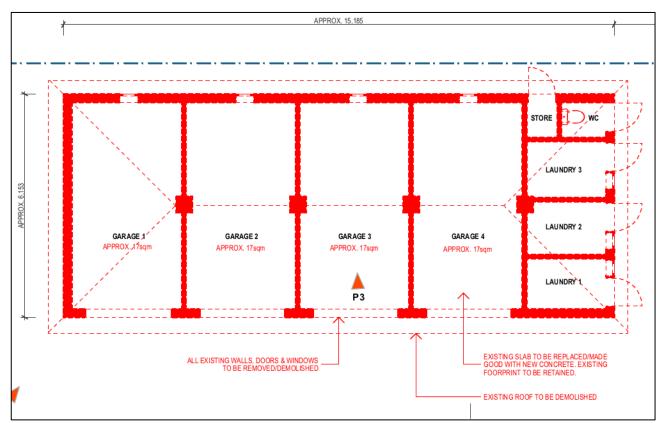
Existing rear garage with laundry facilities. Source: PlanShop.
